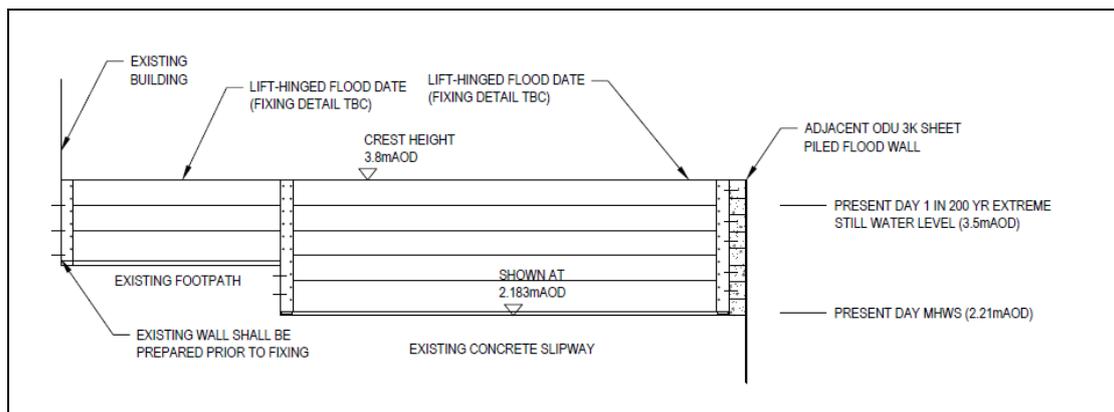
Sketch showing indicative elevation drawing of the flood gates at ODU 3j (not to scale)
